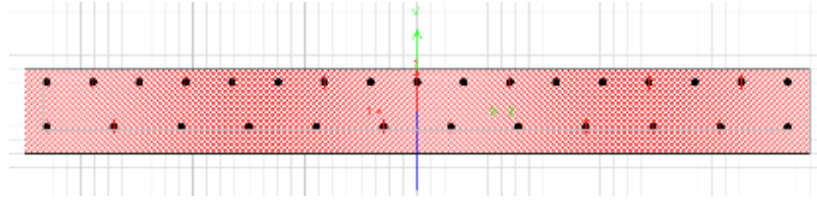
Plan view of the barrier-to-barrier connection
